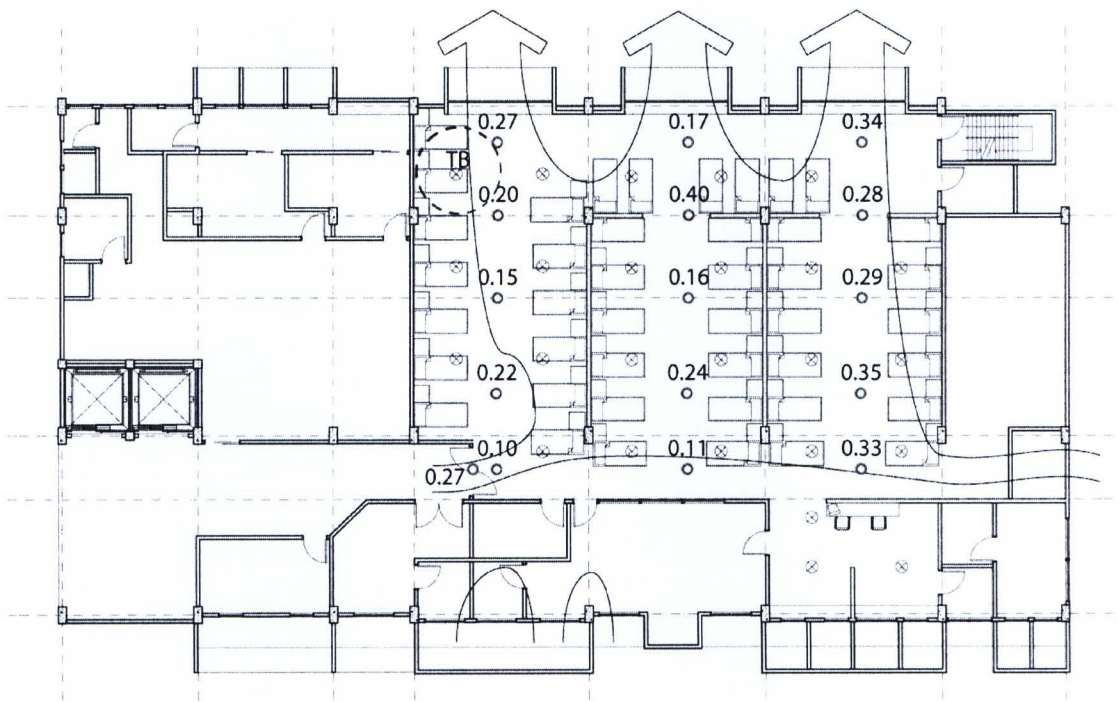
Floor plan and ventilation data of hospital D inpatient ward#2
